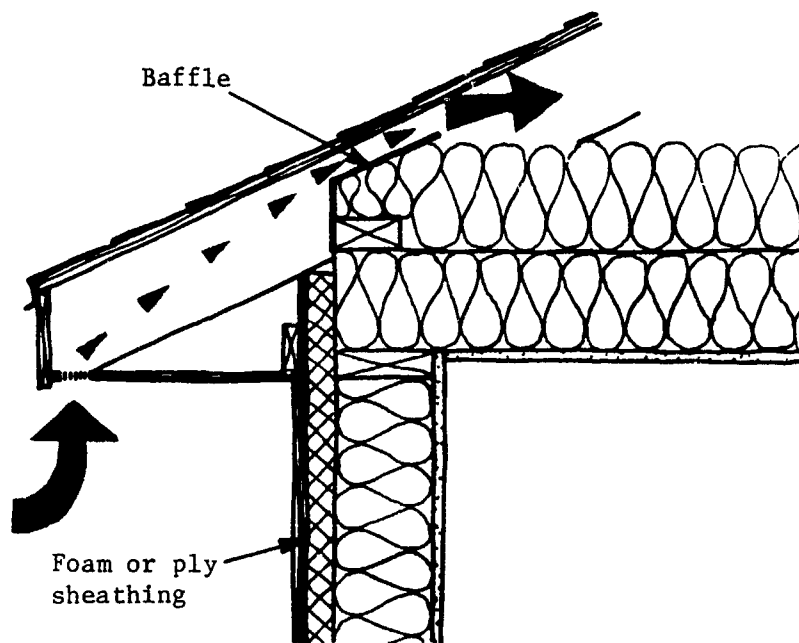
The raised rafter seat and specially-designed cardboard baffle allow for ventilation above the well-insulated corner (courtesy of "New England Builder").
